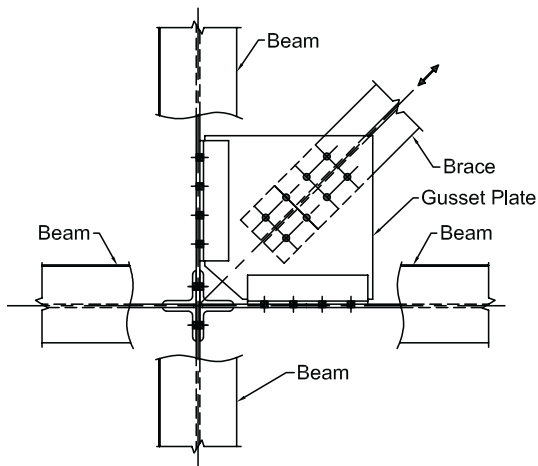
Horizontal bracing details, plan view: beam-to-beam configuration.
